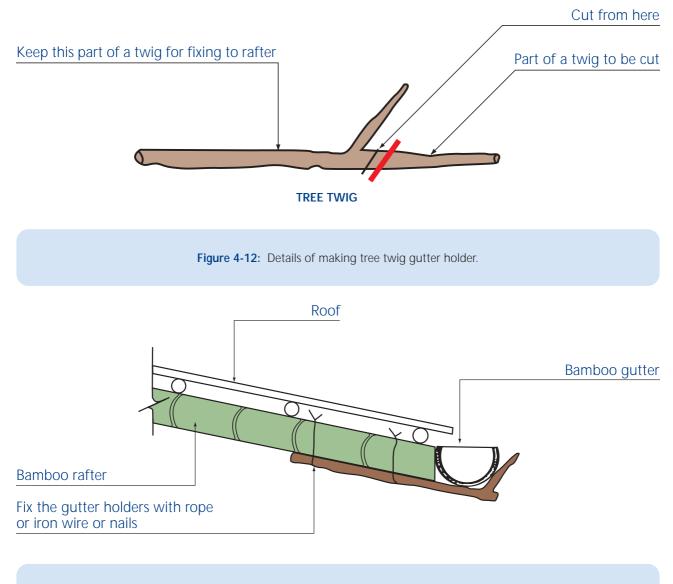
Fix the tree twig gutter holders to the roof structure.
